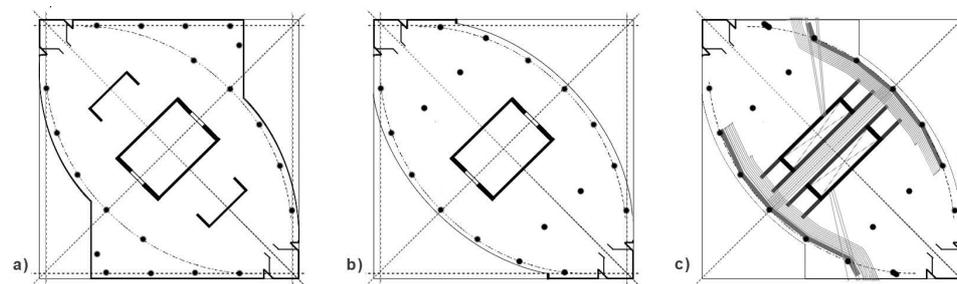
Espacio Tower floor plans at different heights: a) Lower section b) Top section c) Outrigger structure with stiffness belt.
